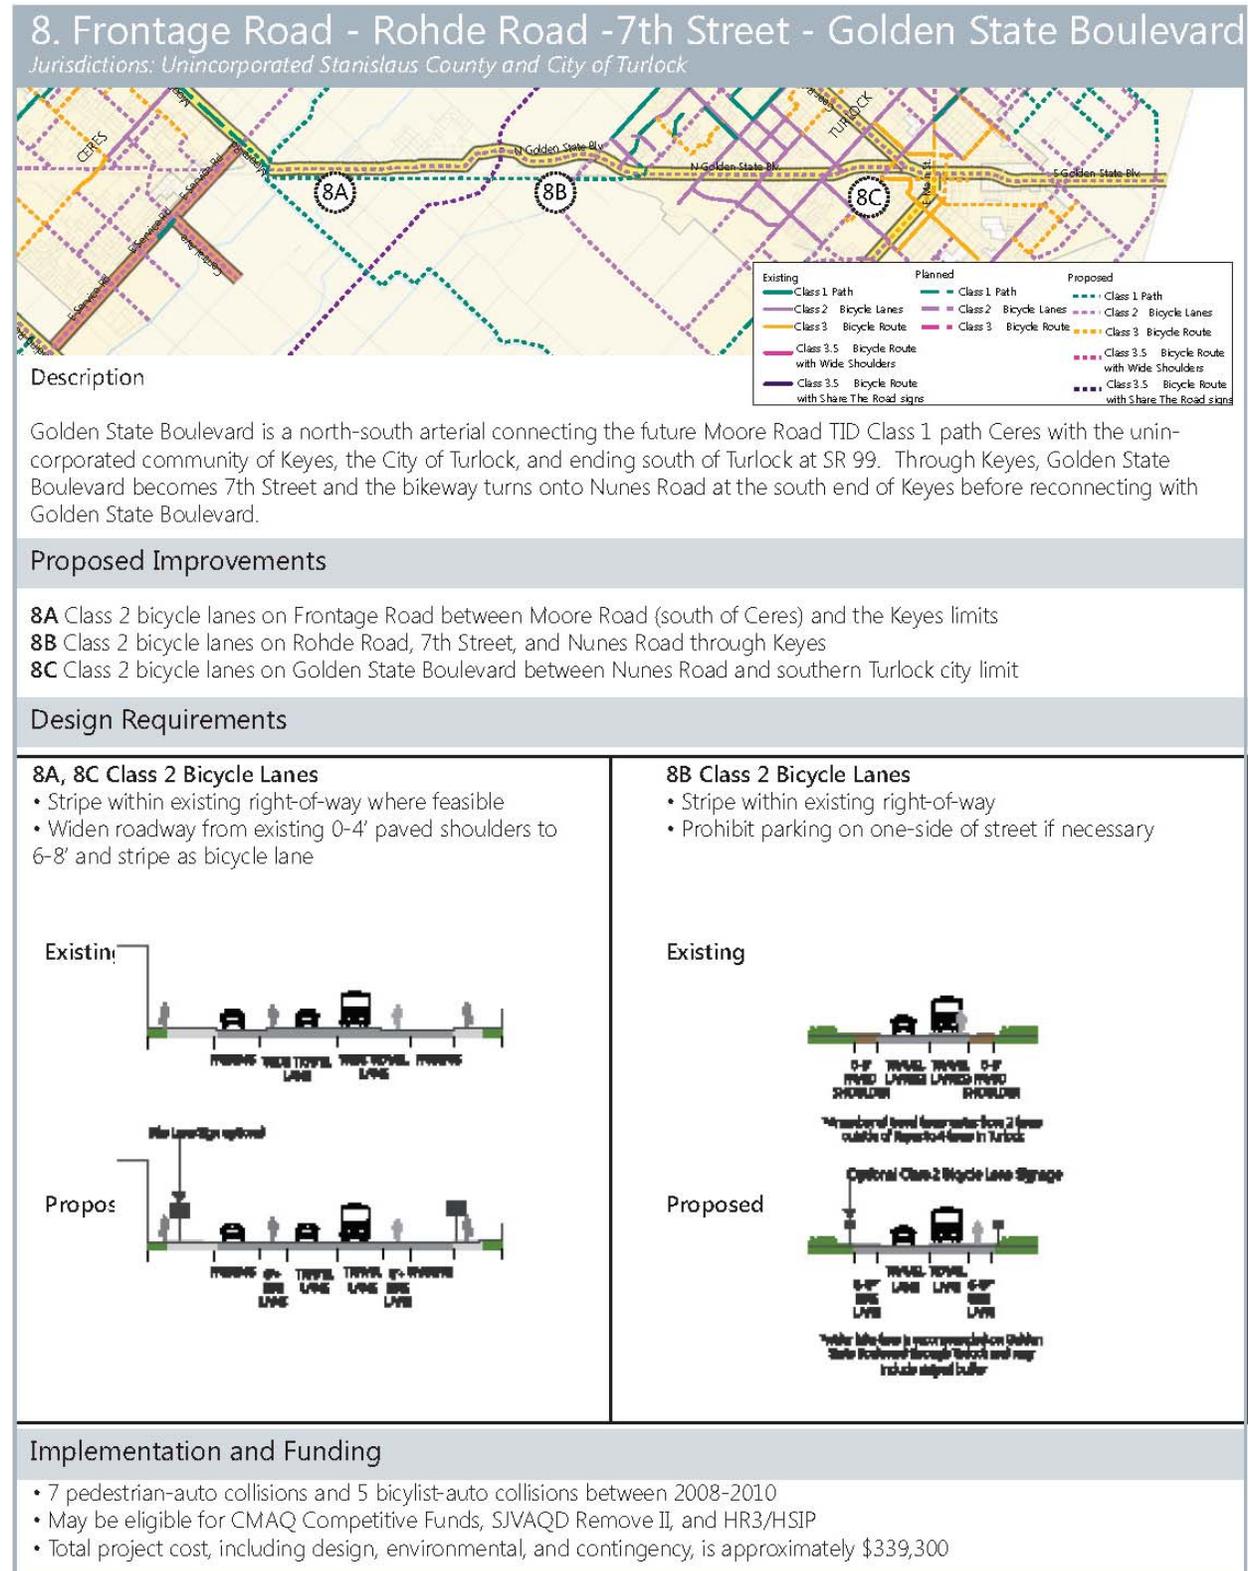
Priority Project Sheet No. 8 for Frontage Road – Rohde Road – 7th Street – Golden State Boulevard
